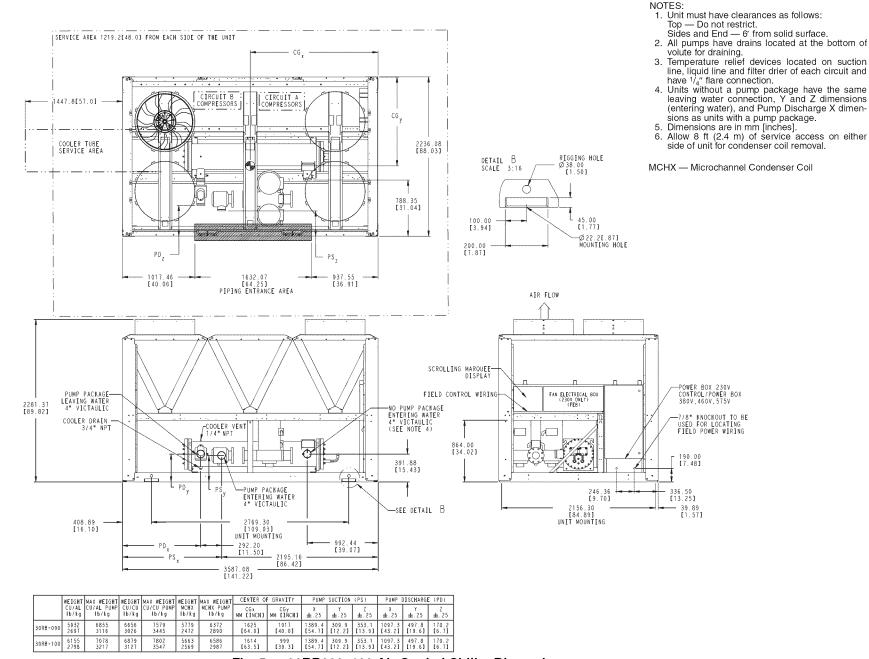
30RB090, 100 Air-Cooled Chiller Dimensions
